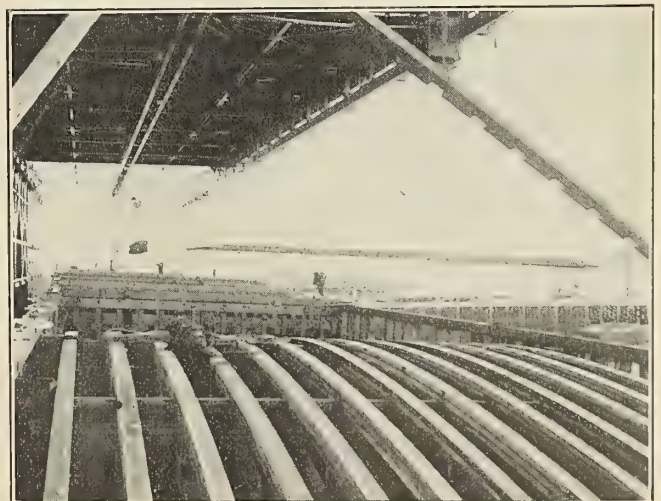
View in Shed. Dock Pontoons Under Construction
